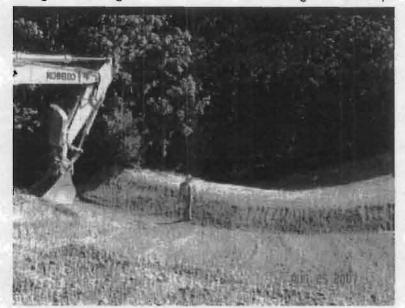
Cutting water bars on Main Tailings Pile - East Slope.
